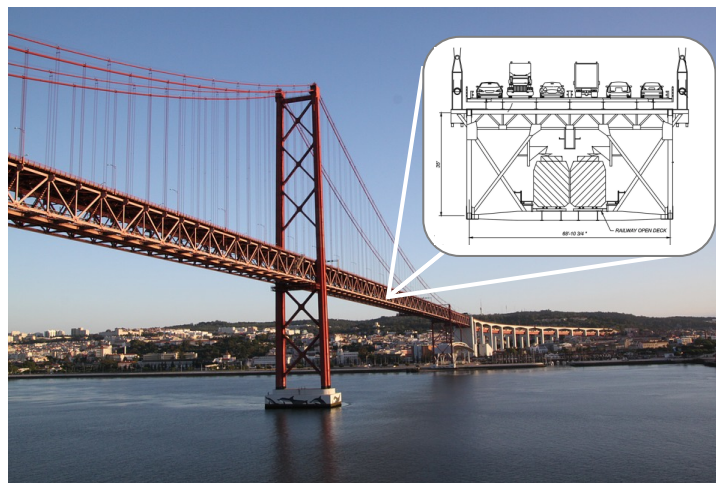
Ponte 25 de Abril Suspension bridge with cross section showing upper road deck and lower railway deck
